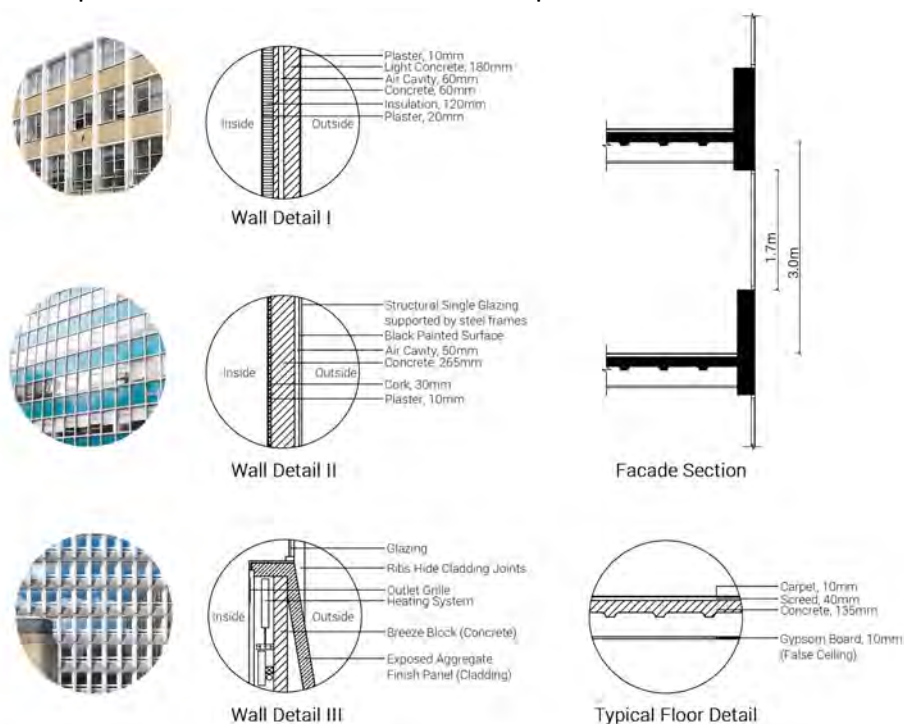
Typical wall construction details of office buildings built from 1950's (Source: Baker, 2009; Botti, 2012)
